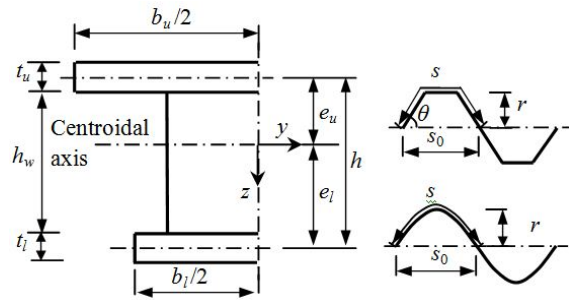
A cross section of bridge and typical web corrugations: (a) a typical section; and (b) typical web corrugations
